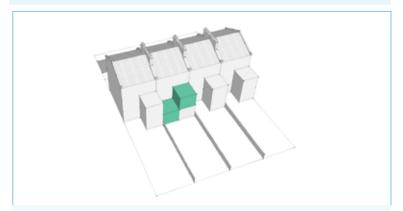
Acceptable extensions above single storey with full width at ground level, half width at first floor level and set down one storey below the eaves.
